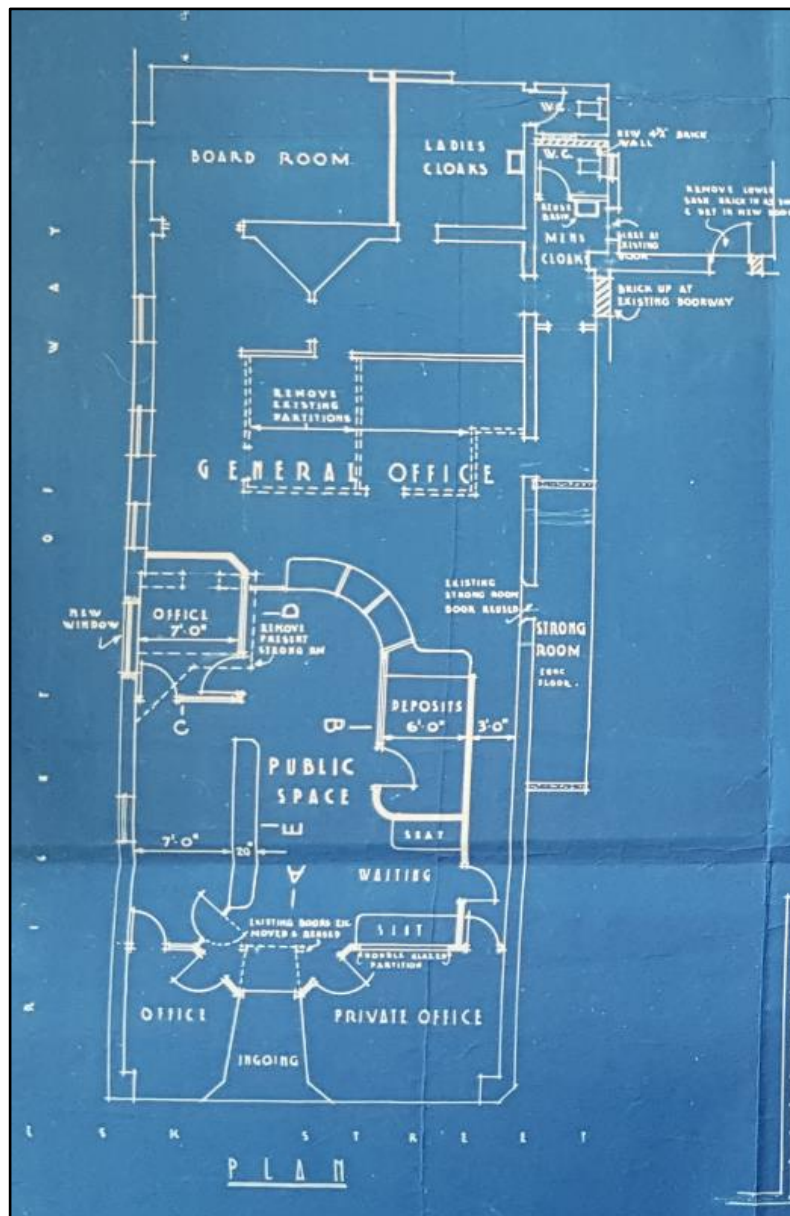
Detail from 1949 plan of alterations to the floor plan of the eastern shop in the Temple Chambers at 45-49 Esk Street (Ford Gray & Derby, 1949).
